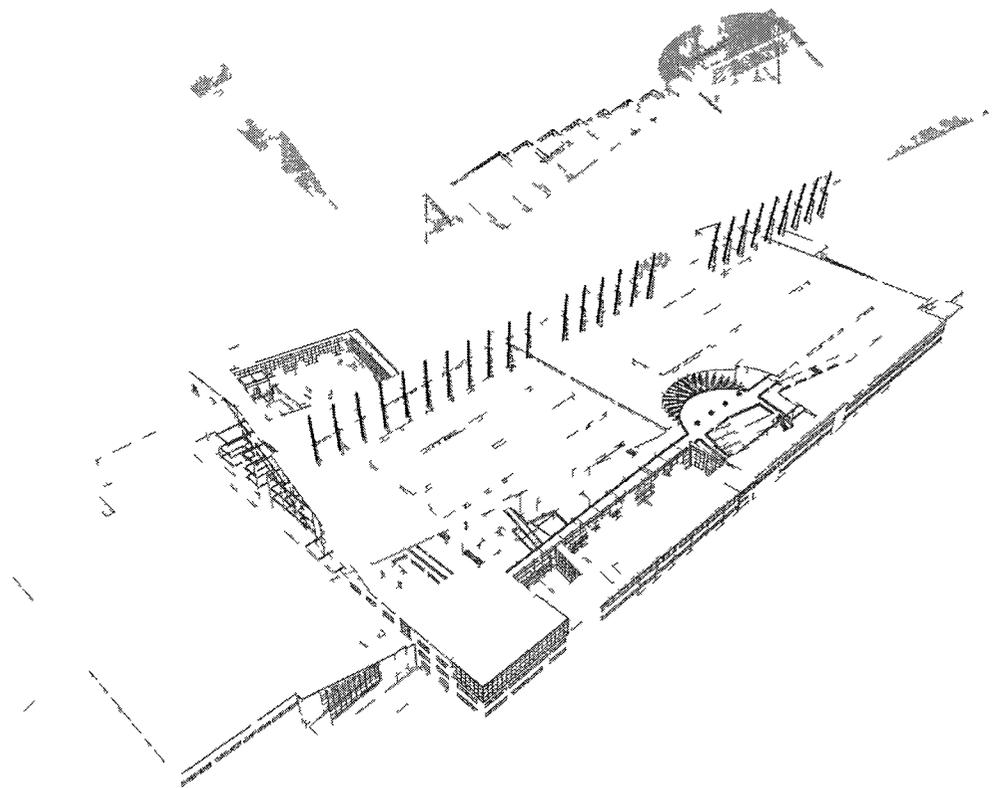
Axonometric drawing of reconstructed roof locations Author
